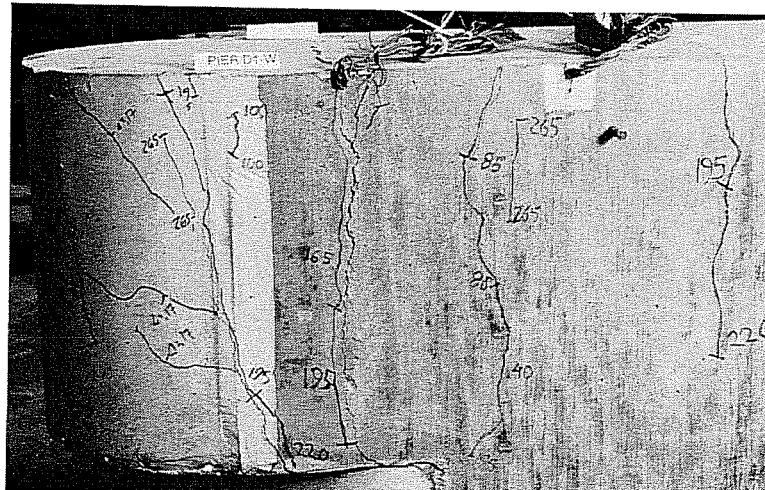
Crack Distribution on the Face of Pier D-1 After Failure
